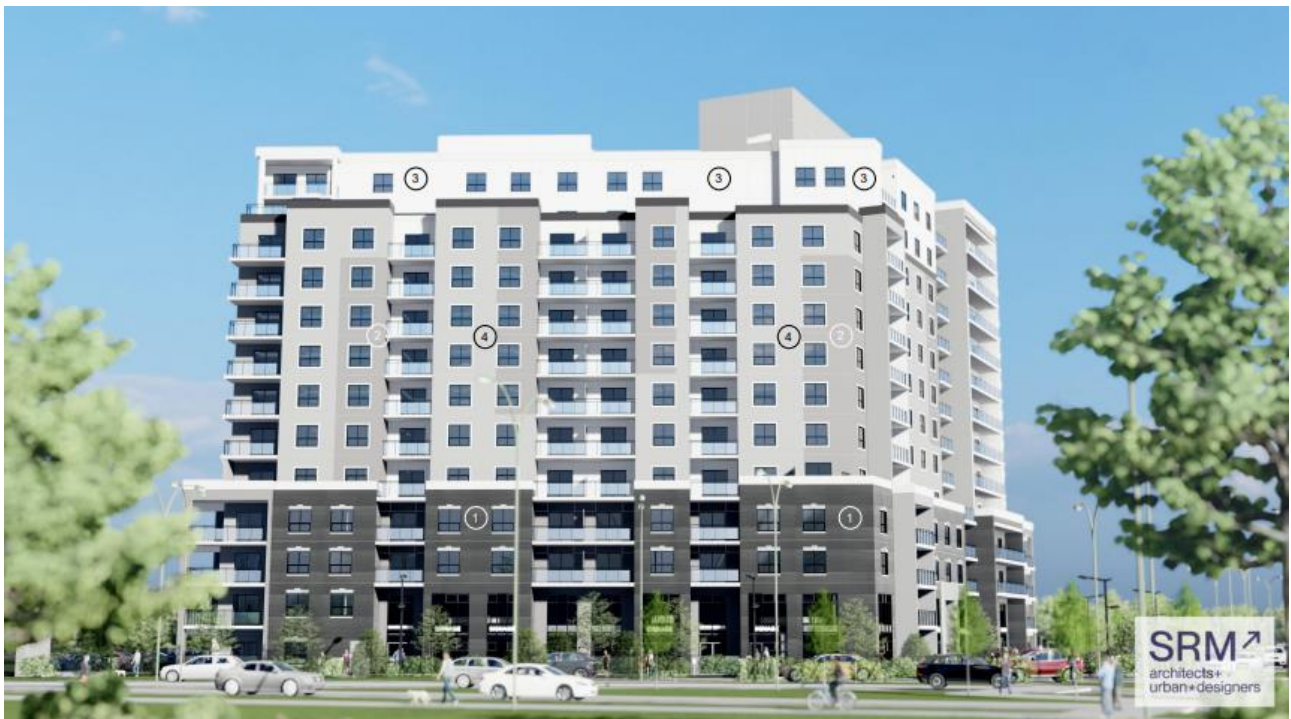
Excerpt of Conditionally Approved Site Plan Drawing
